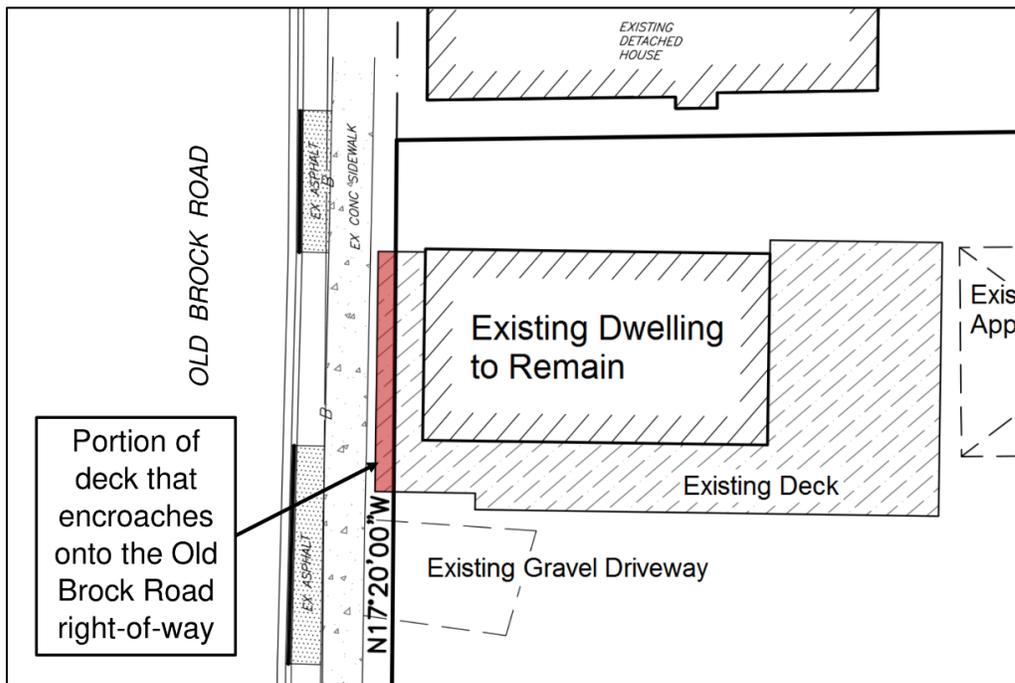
Portion of deck encroaching onto the Old Brock Road right-of-way
